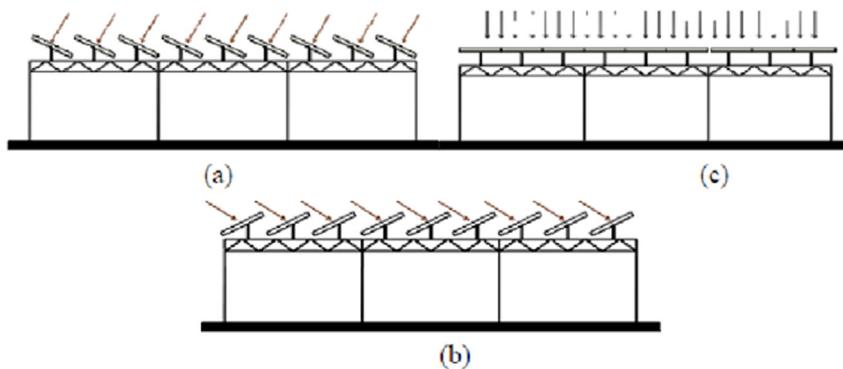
(a) Panels oriented towards morning sun. (b) Panels oriented directly under midafternoon sun. (c) Panels oriented towards afternoon sun [31].
